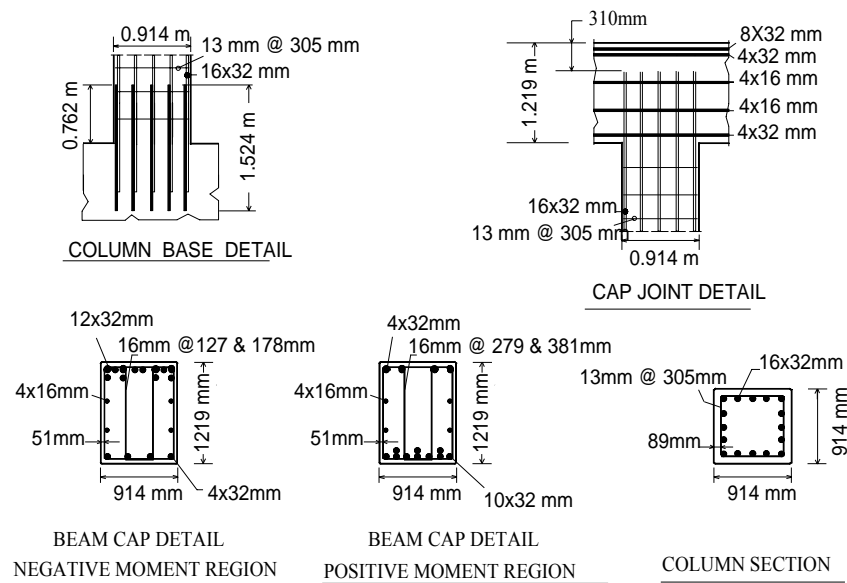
Cross-sectional reinforcement details for Bent #5S (2000)
